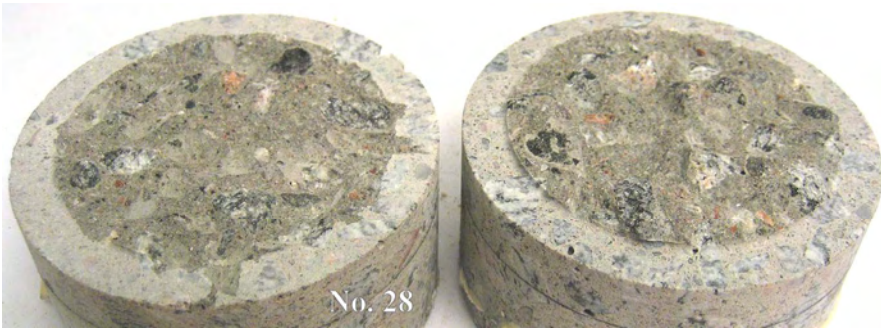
Photograph showing the failure surface for test No. 28 after fatigue test.
